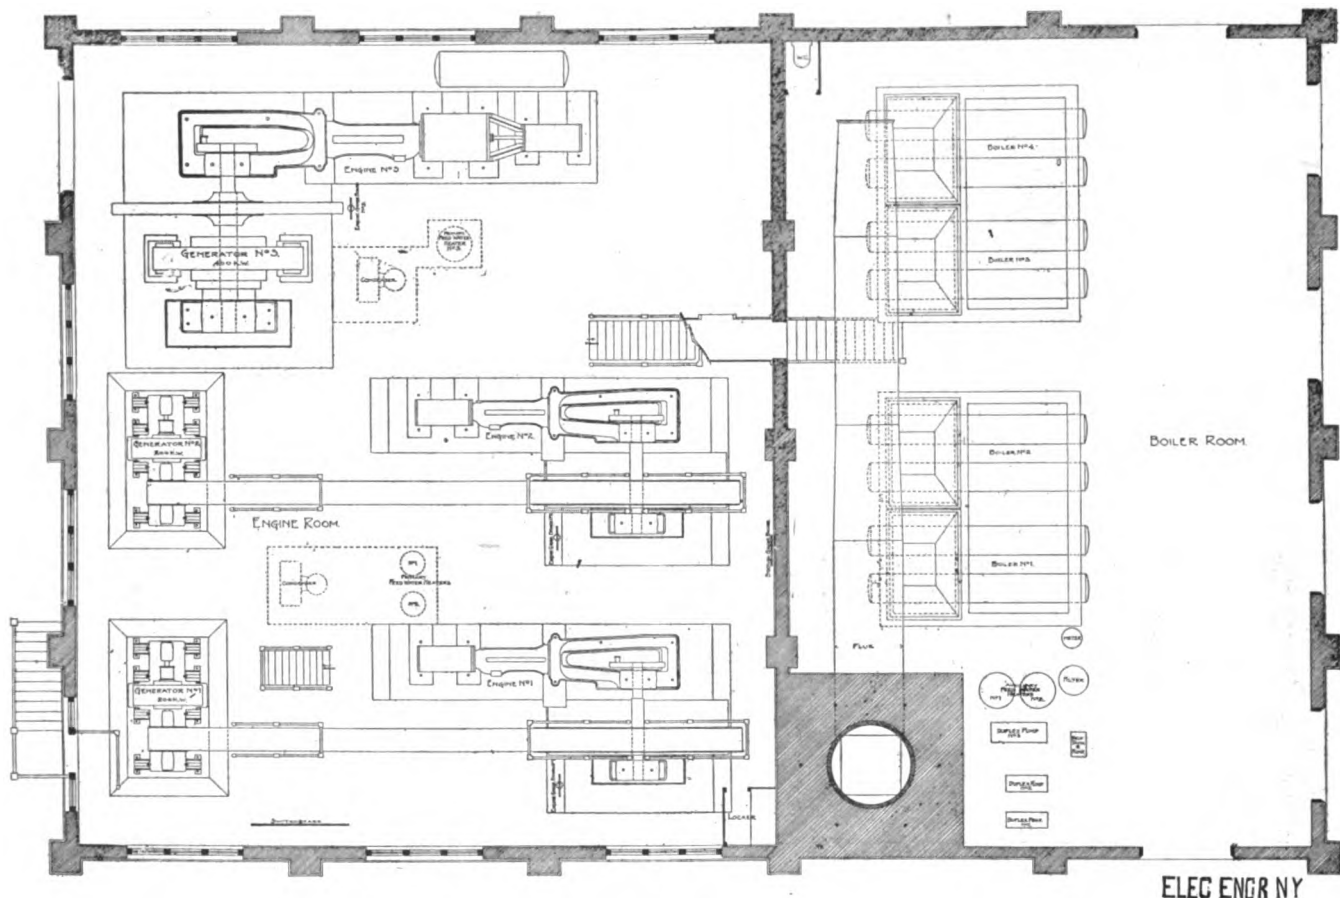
PLAN OF ENGINE, DYNAMO AND BOILER ARRANGEMENT, BERGEN CO. TRACTION CO.—FORD & BACON, ENGINEERS.
